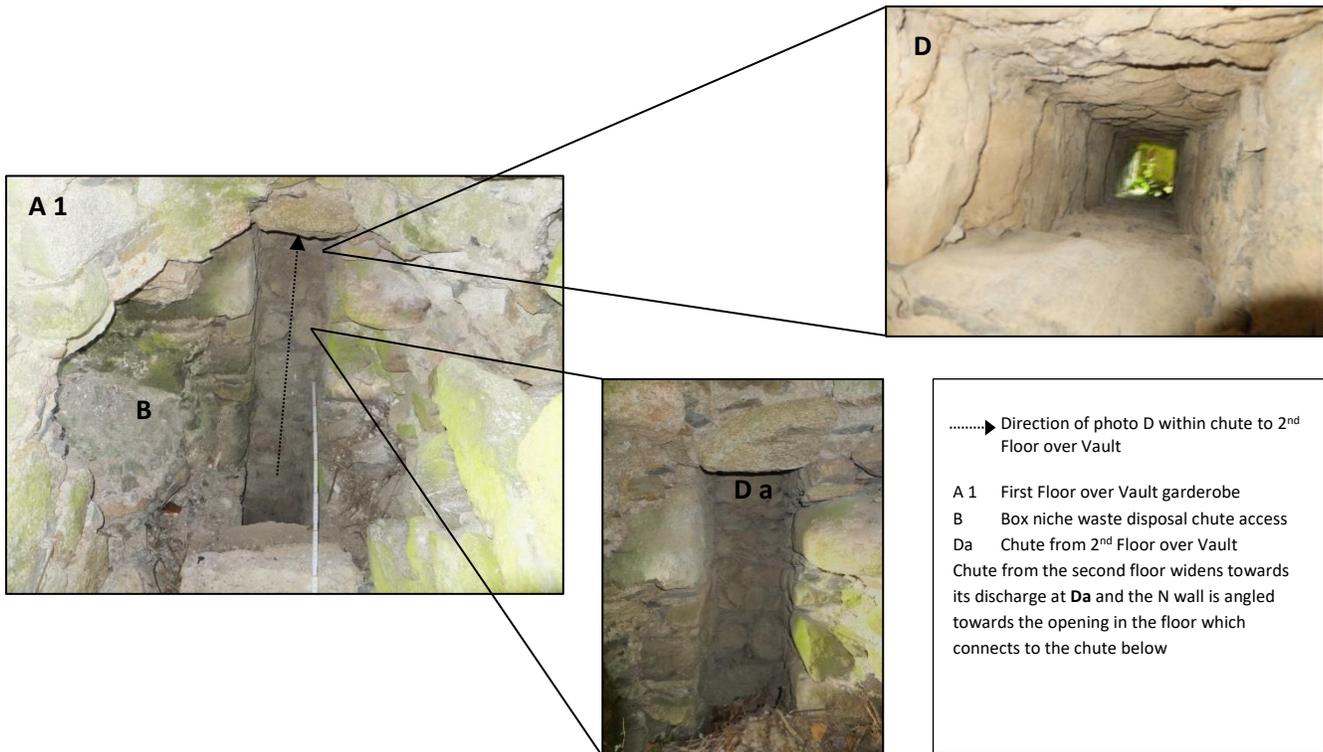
First Floor over Vault garderobe looking north. (Photo's: Author)
